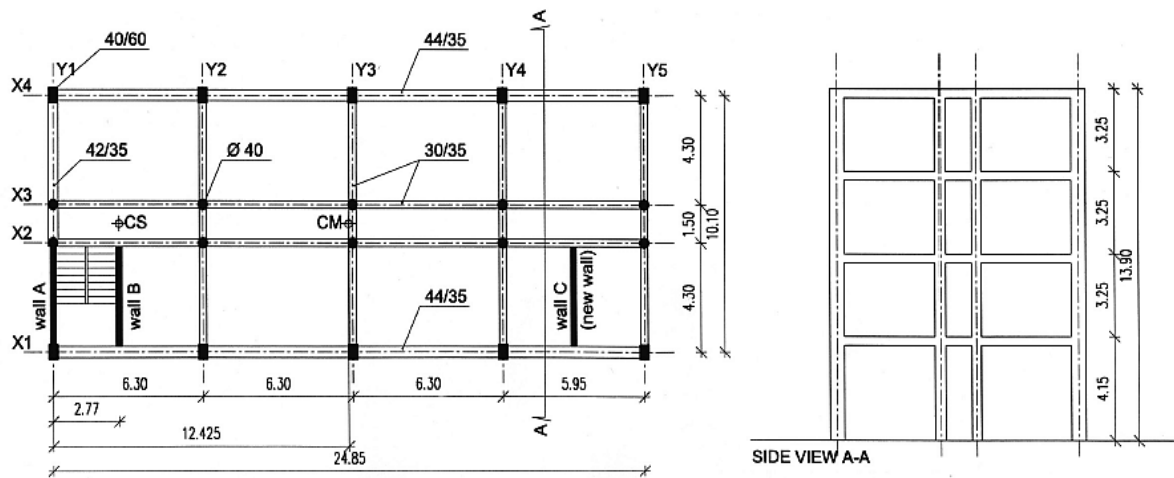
Plan and elevation views from the RC frame-wall building.
